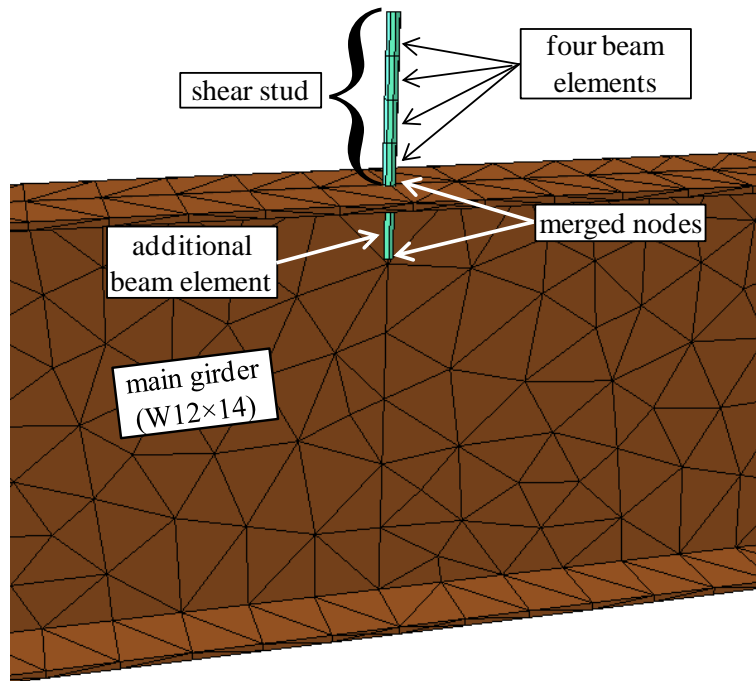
Detail of the shear stud attachment to the beam top flange
